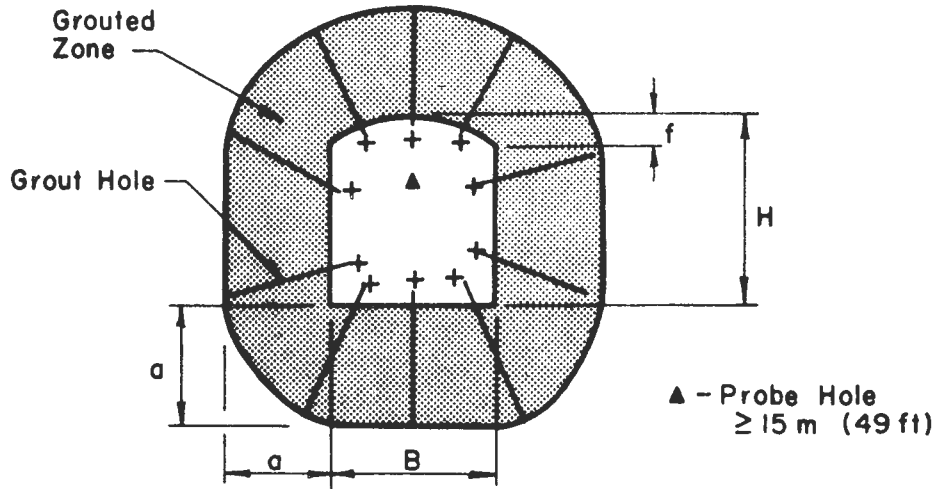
shows the typical pattern of pregrouting that is performed for rapid transportation tunnels in Stockholm. A probe hole is directed 15 m (49 ft) in advance of the tunnel face and water tests performed to estimate grouting requirements. Grouting is performed from a series of holes that are splayed forward around the periphery of the tunnel. The holes are advanced a minimum horizontal distance of 2 m (6.6 ft.) beyond the forthcoming drill-and-blast round.
